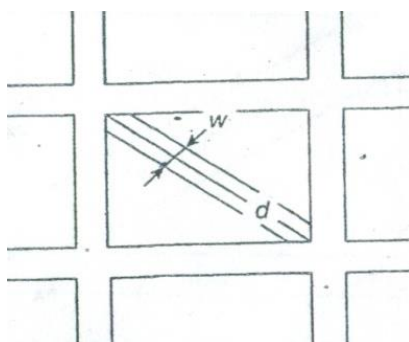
Modeling of masonry infill wall as equivalent diagonal strut element
